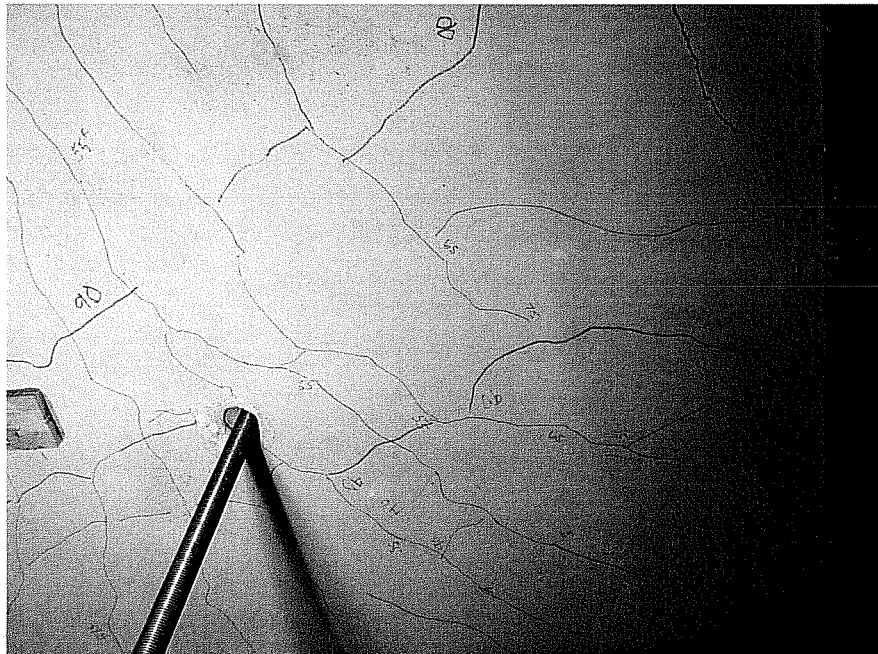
East exterior 8-ft bay failure at bottom of slab, facing west
